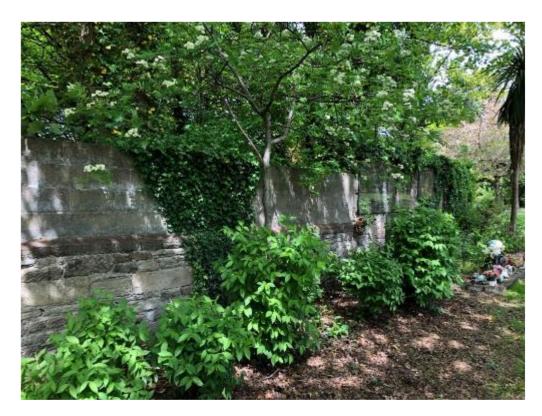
Existing boundary wall, photographs taken from the neighbouring site, June 2022.
